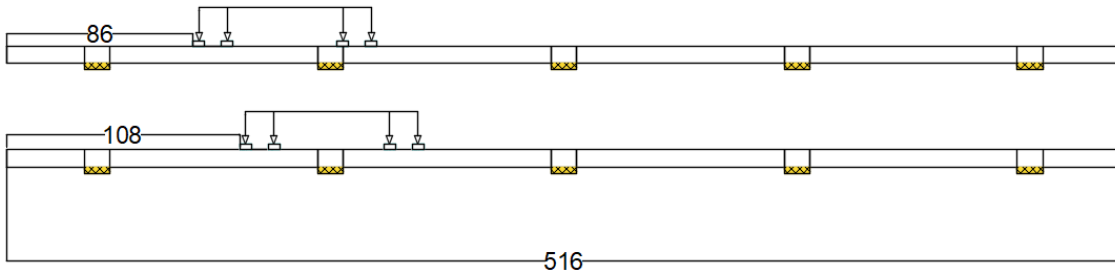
Location of P-15 truck for 9 ft girder spacing deck slab (Case 1, unit: in)
